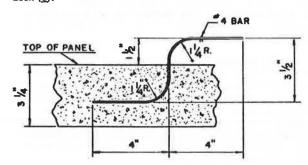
Z-bars used in selected panels to aid in providing structural connection between panel and cast-in-place deck (3).
